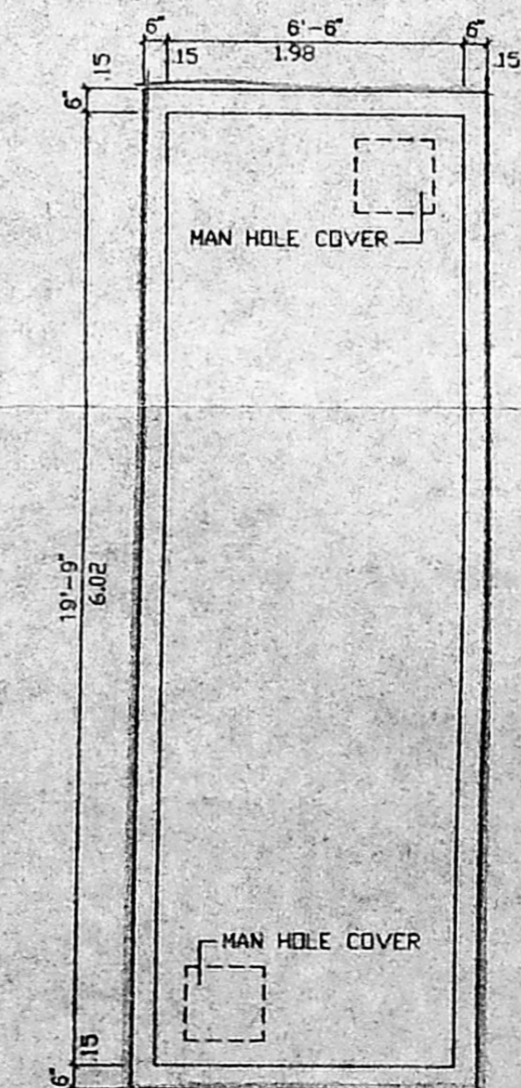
DETAILS OF COMPOUND WALL AND STORM/RAIN WATER STACKING
